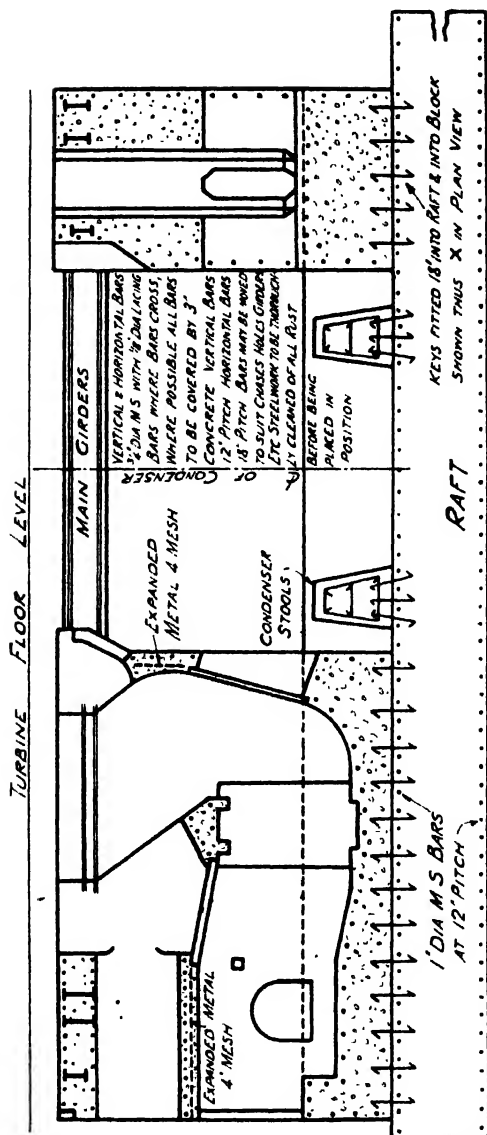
Turbo-Alternator Foundation. (Sectional elevation.)
